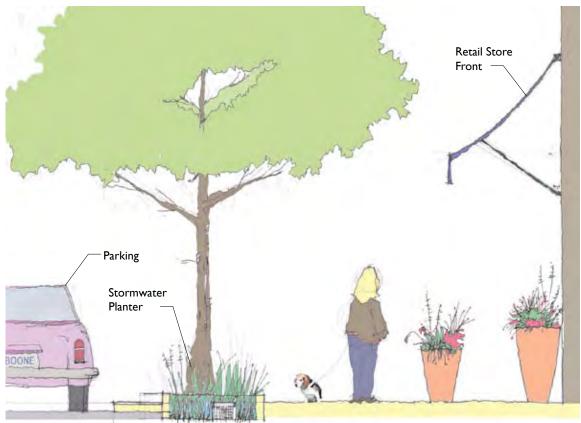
Parking, Stormwater Planter, and Sidewalk at Retail Store Front
